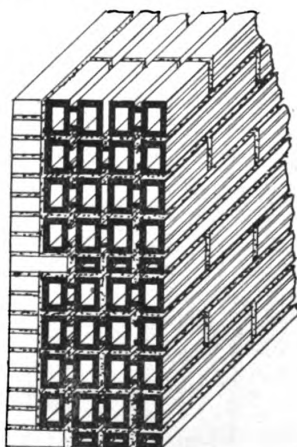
Tile one cell high can be used. It is cheaper to lay a wall with the three cell tile, as the higher tile need less labor in setting for a given height of wall, besides requiring less mortar.
